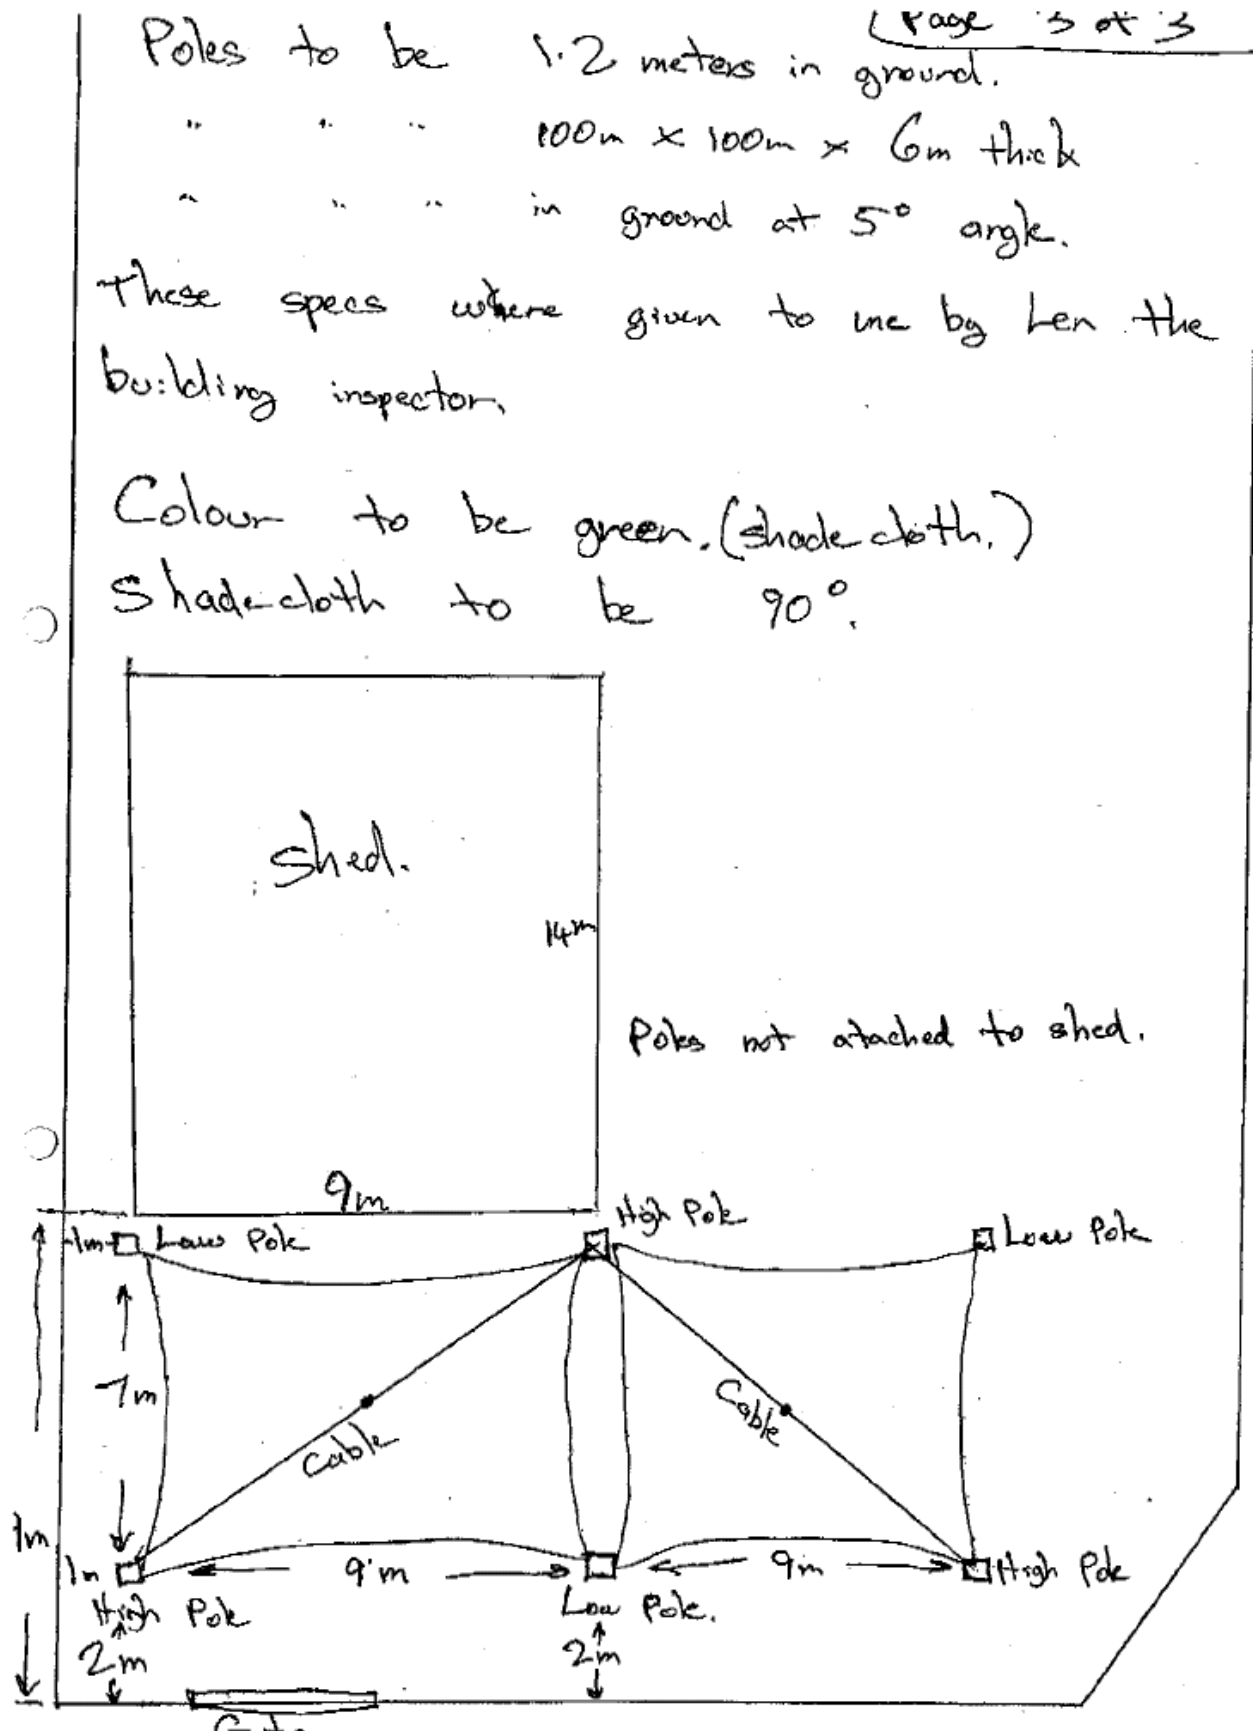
SITE PLAN (INCLUDING PROPOSED SAILS SHADING)
